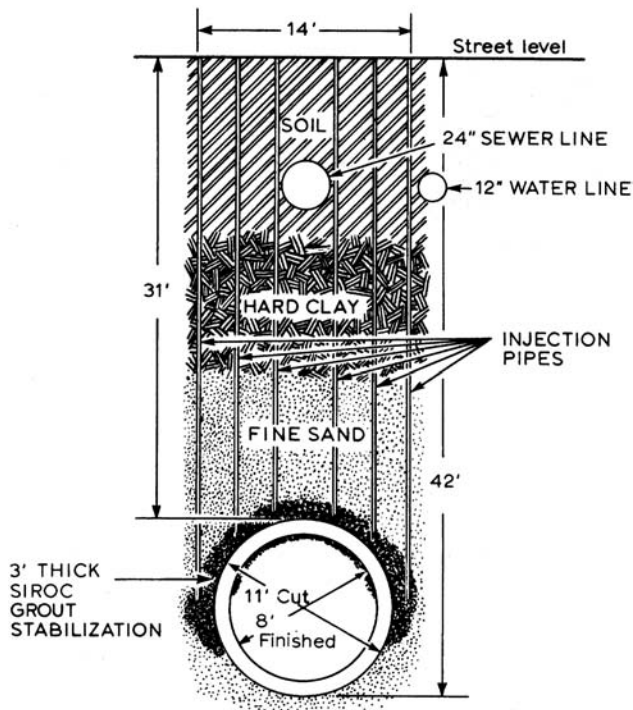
Stabilization of sand to prevent foundation movement. (Courtesy of Raymond Concrete Pile Division, NY.)
